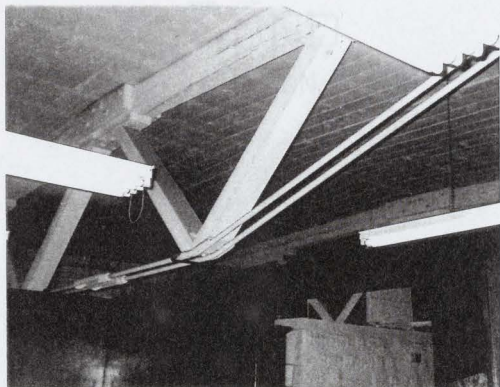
Warehouse 1 roof truss. Part of the vault is visible in the background. 1992 photo by the author.
